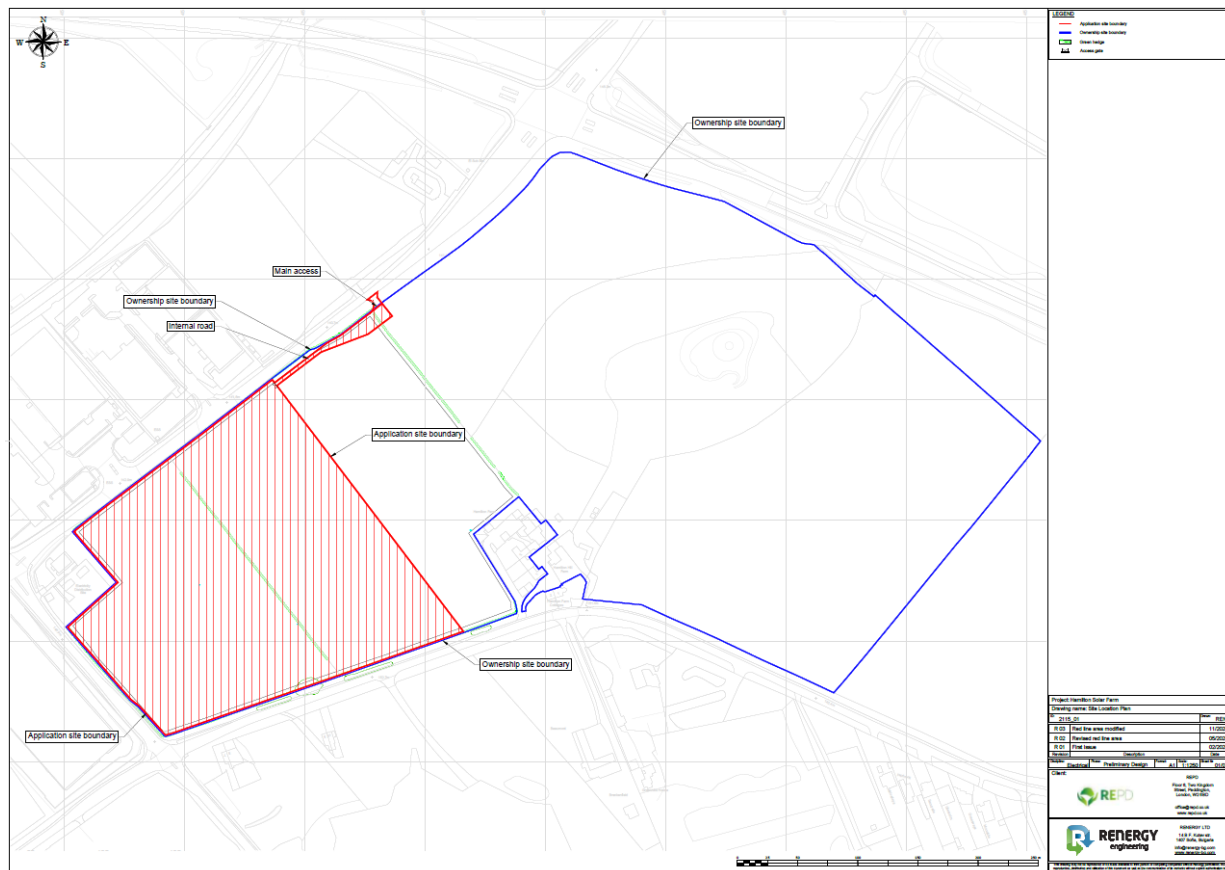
Site Location Plan (Drawing Ref : 2115_01_Rev03)
